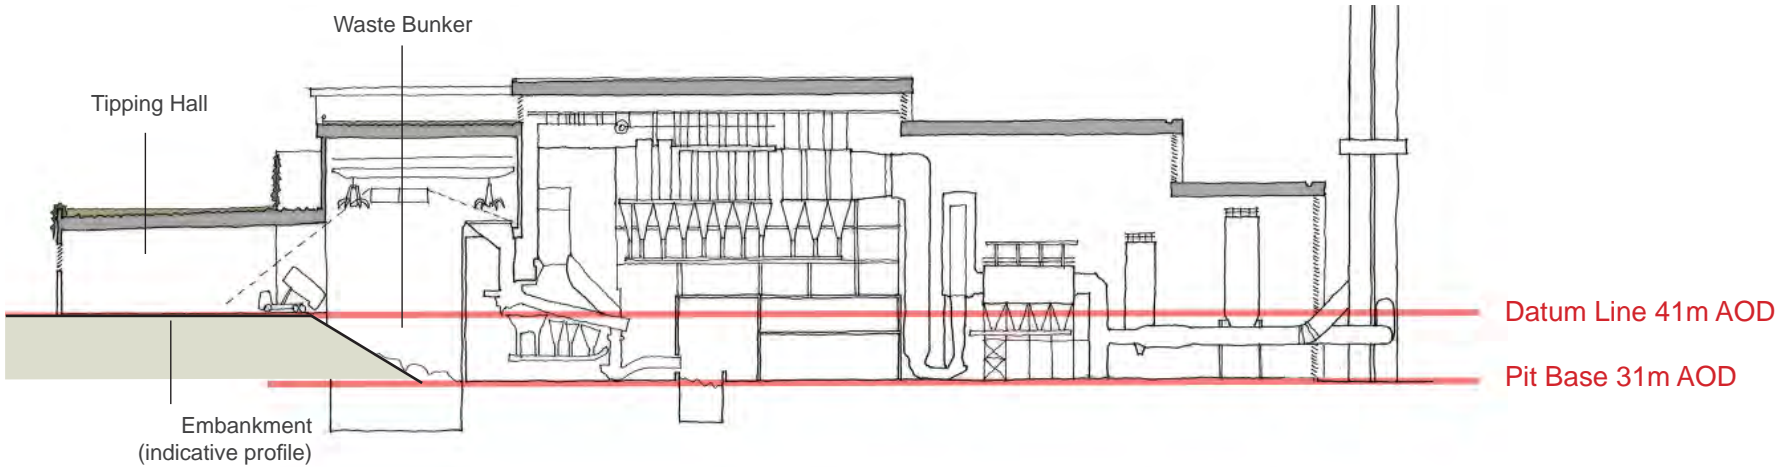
Illustrative Arrangement of Tipping Hall on Pit Embankment
